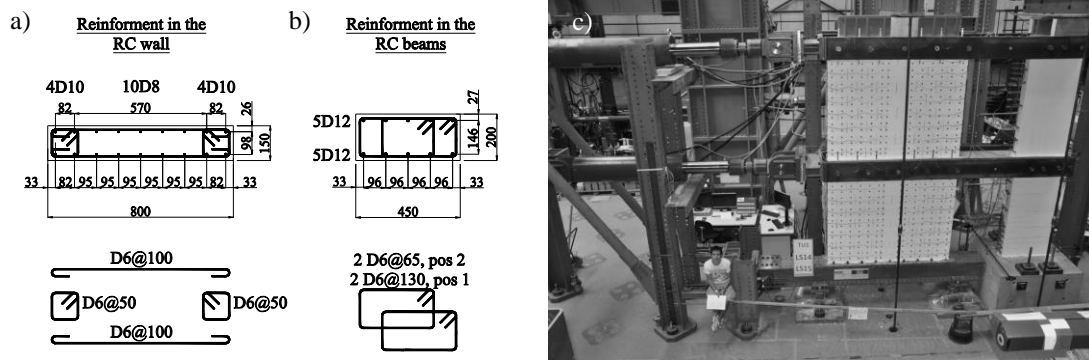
Reinforcement layouts of TU1 and TU2: (a) reinforcement layout of RC walls, (b) reinforcement layout of RC beams, (c) Test set-up showing TU1.
